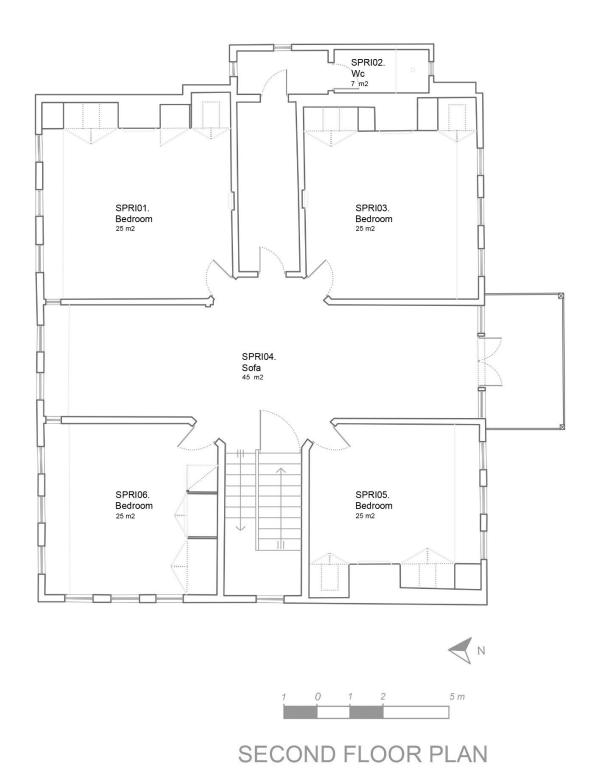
Pre-intervention second floor layout of Hacı Rıfatlar house (redrawn by
